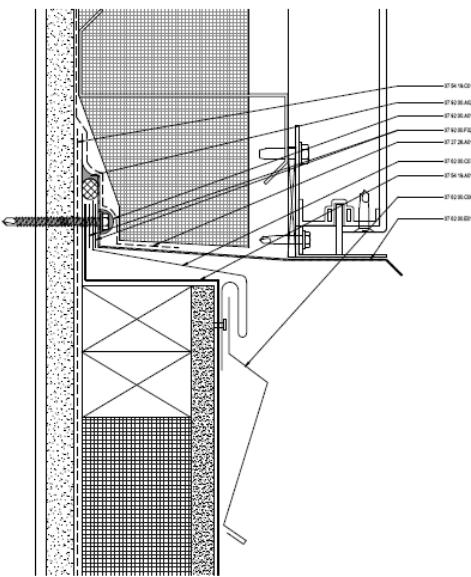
| Metal Panel Connection Detail (SmithGroupJJR)
